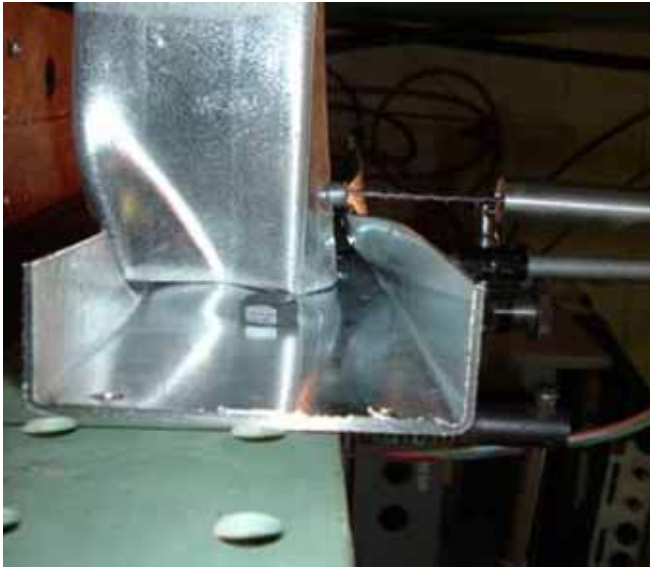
Test specimen showing screw shear/tension failure. Figure 2: Test specimen showing track failure on built-up jamb.
